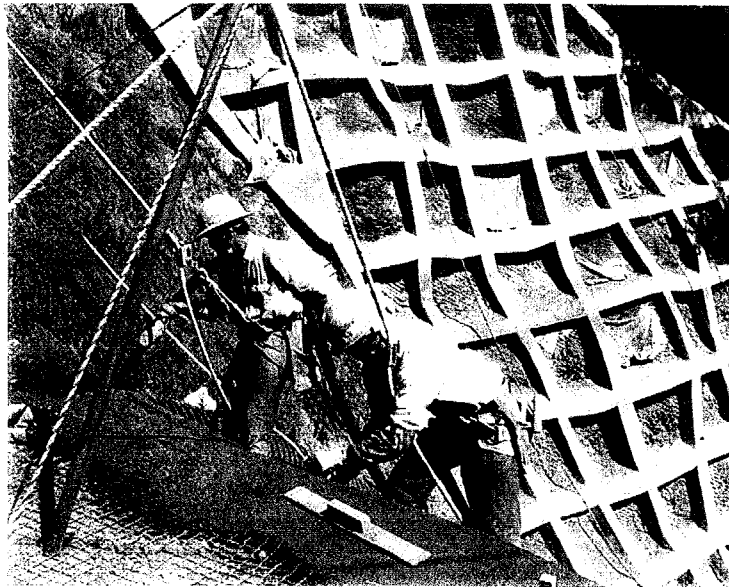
Workers suspended by ropes on about 70 degree slope.
